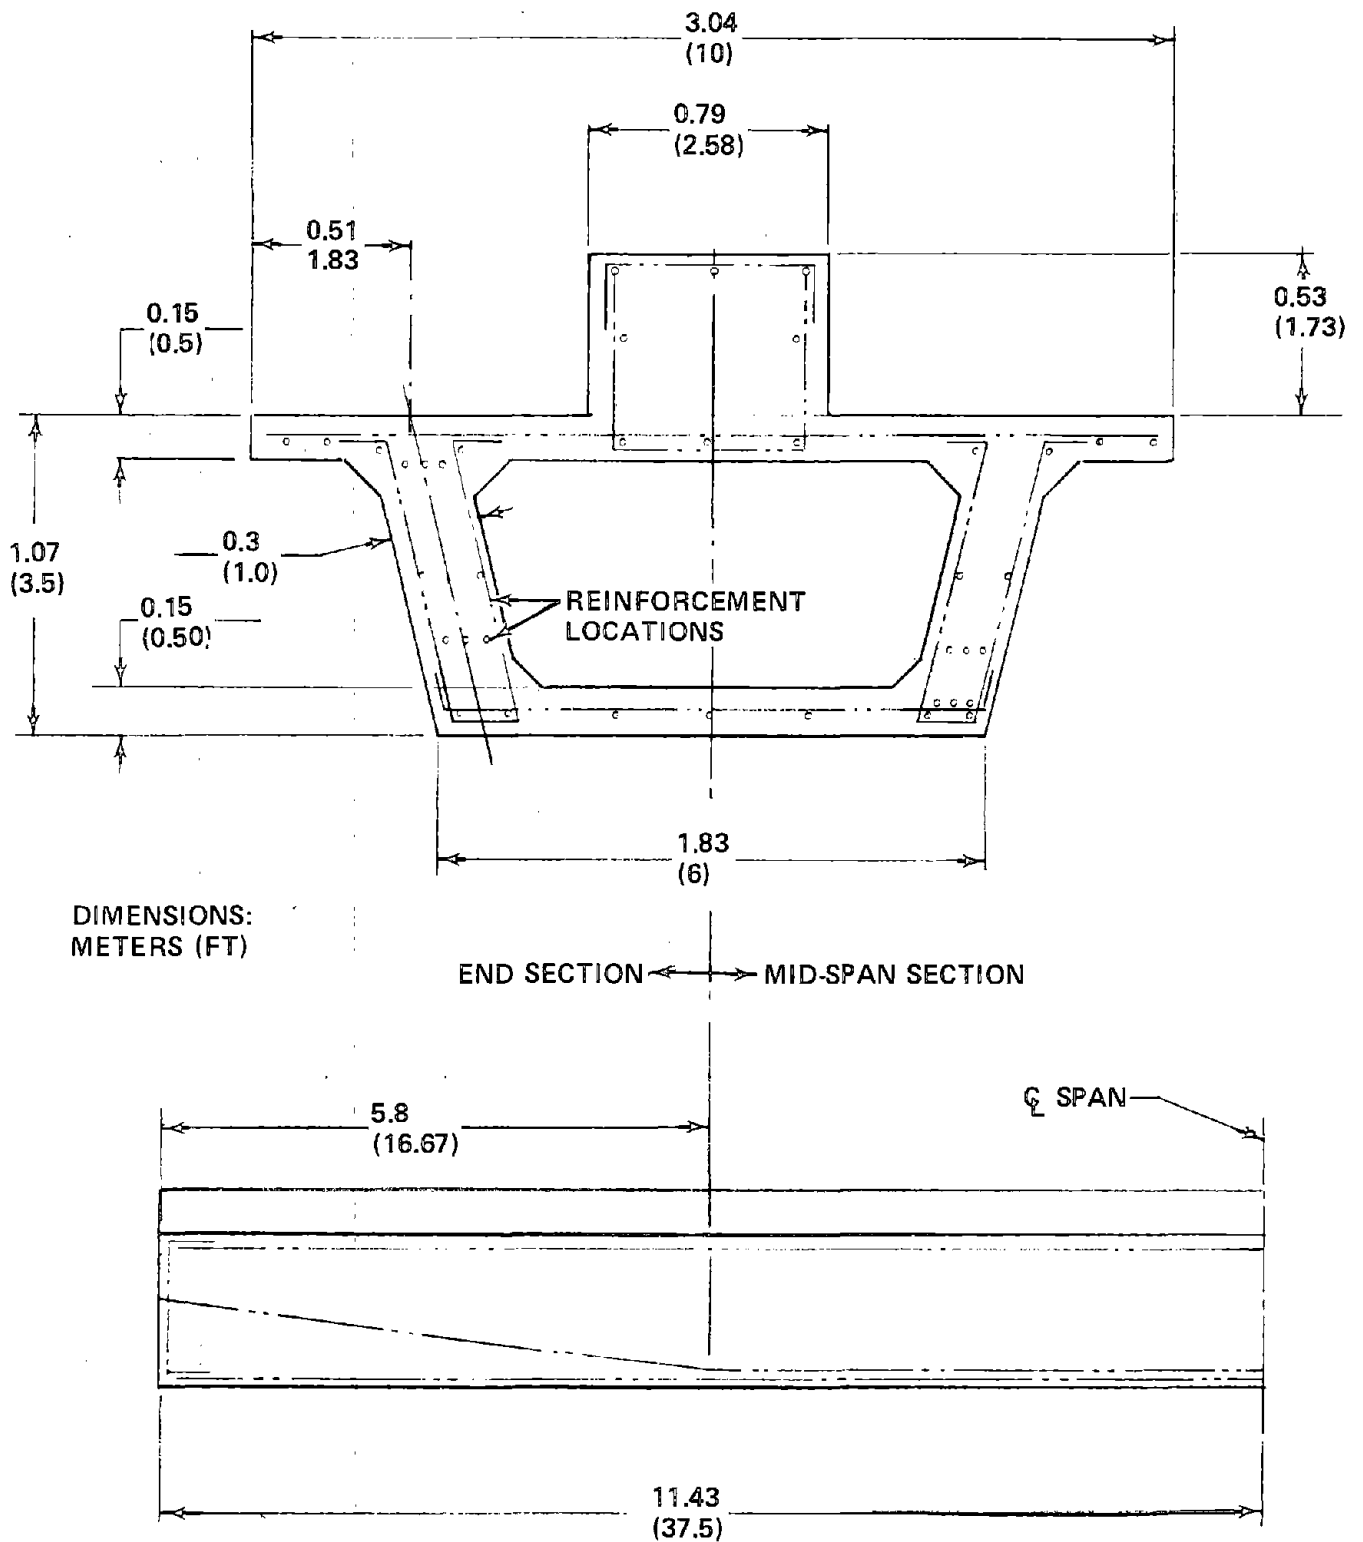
DETAILS OF 22.8 m (75 FT) SPAN - BOX GIRDER
